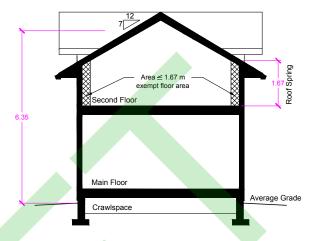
Cross section drawing of a Garden Suite showing an integrated roof form and a 1.67 m roof spring
